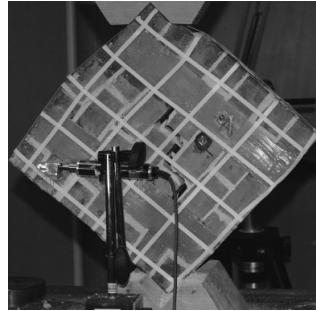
Failure Pattern of GFRP+PP-band retrofitted masonry wallet
